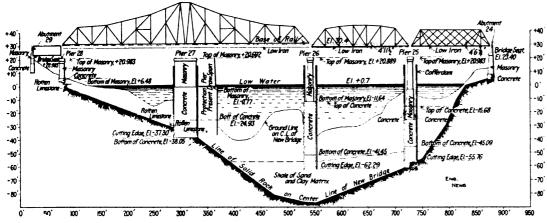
PROFILE AND ELEVATION OF THE WEST CHANNEL PORTION OF THE NEW CLINTON BRIDGE; CHICAGO & NORTHWESTERN RY.
